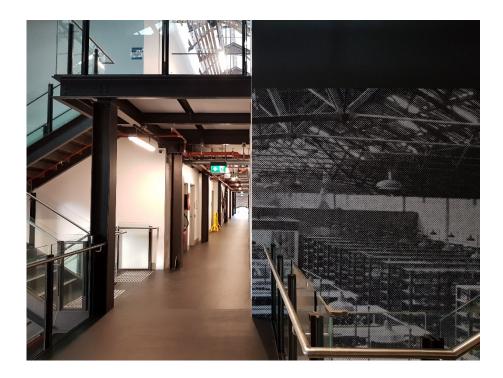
Bay 15 north, heritage image as a wall feature (14 March 2022)
